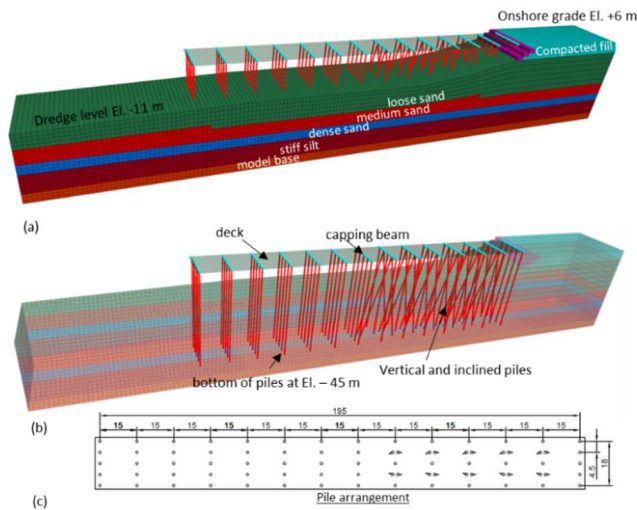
(a) Pier geometry with filled zones filled, (b) Model geometry with transparent zones showing structures, (c) Pile arrangement
